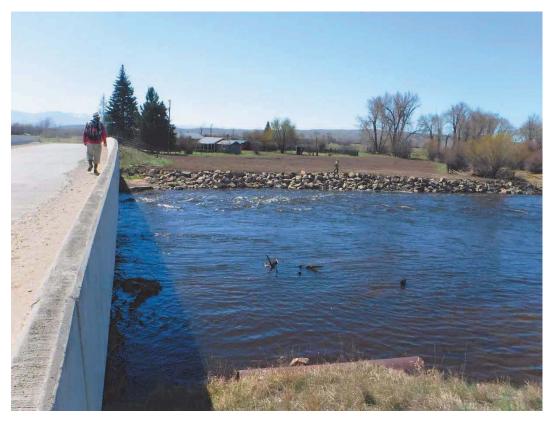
Right bank of Sub-Reach 5 in April 2016, following placement of bank stabilization (riprap). View is from upstream rail of Pennington Bridge.
